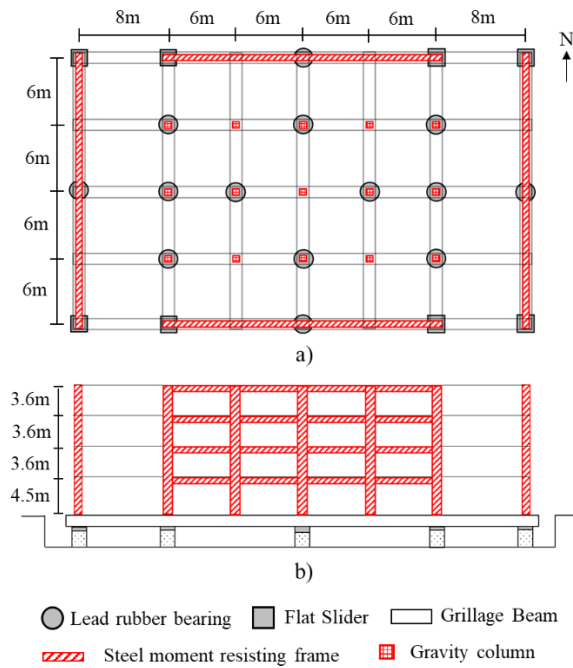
Structural layout of the steel moment resisting frame structure, a) plan view and b) south elevation.
